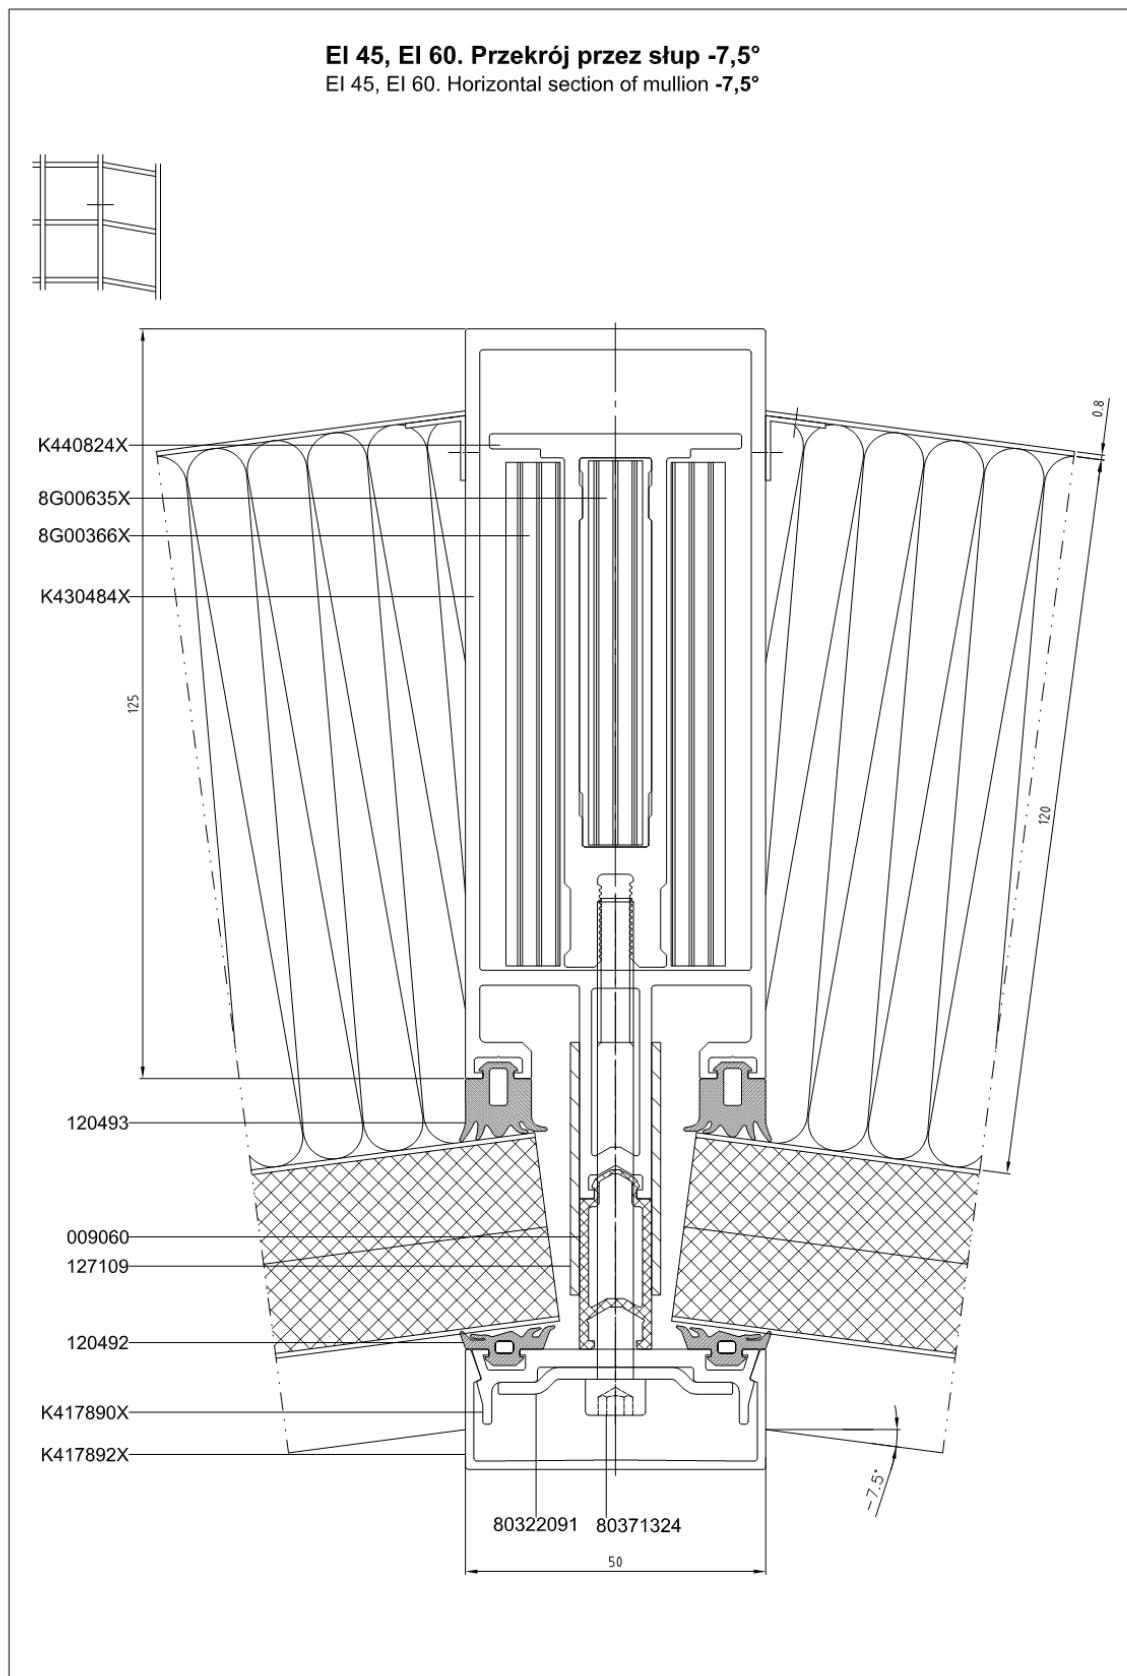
Cross-section through the typical MB-SR50N EI EI60 system mullion for small (up to 7.5 degrees) angles between adjacent curtain wall segments
